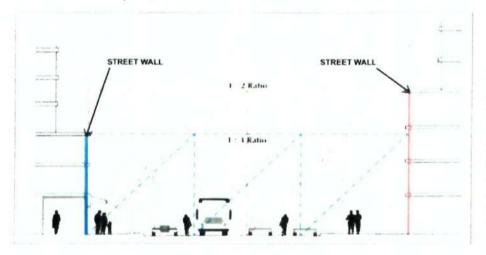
A building height-to-street-width ratio of between approximately 1.3 and 1.2 is recommended to frame streets and provide human scale. Portions of buildings above the street wall are encouraged to step back.
